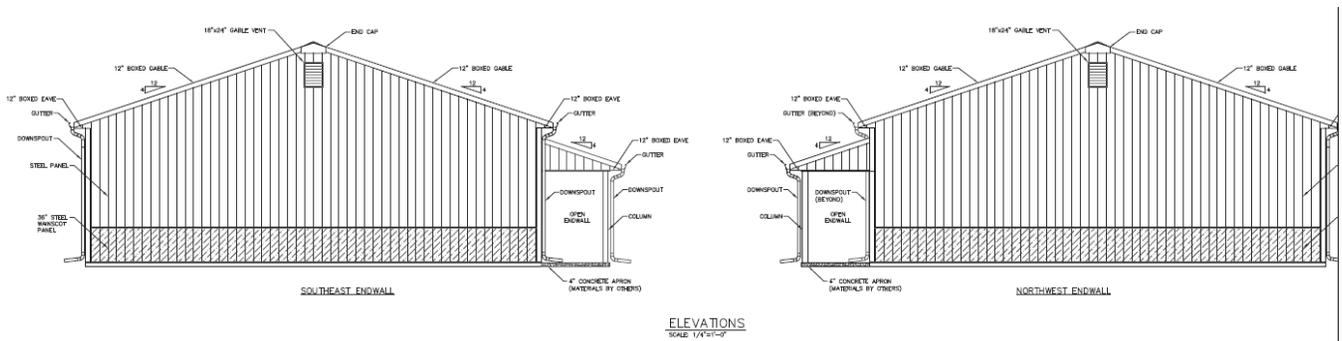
Side Elevations of the outside storage that will be built in the back of the property.
